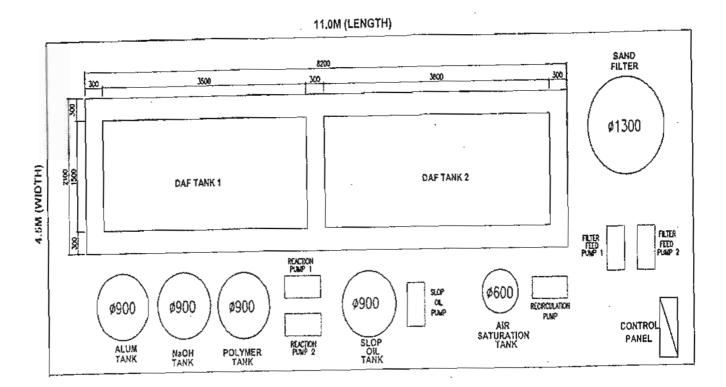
Layout Plan of Oily Wastewater Treatment Plant, Treatment Capacity 2 m³/hr
